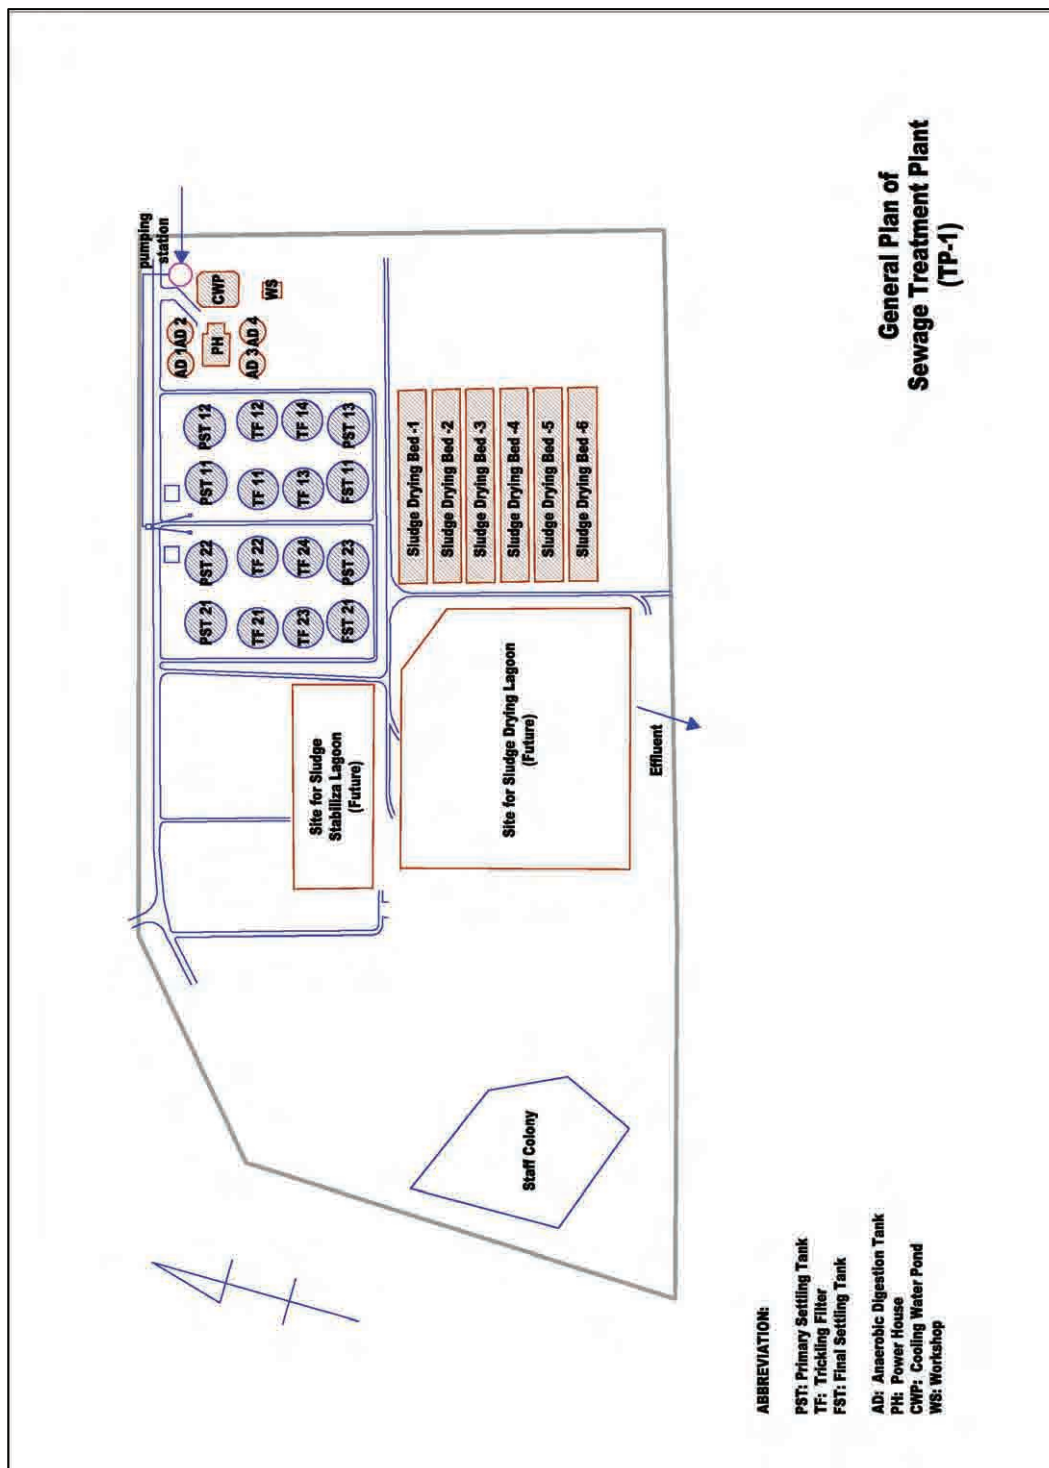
General Plan of Sewage Treatment Plant TP-1
